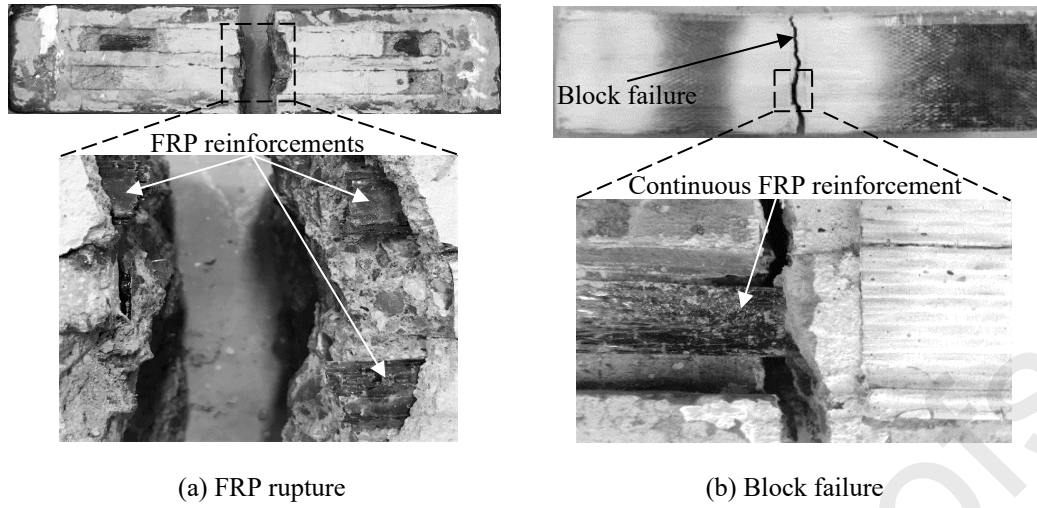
Typical failure modes of (a) double-groove tests and (b) side-groove tests.
